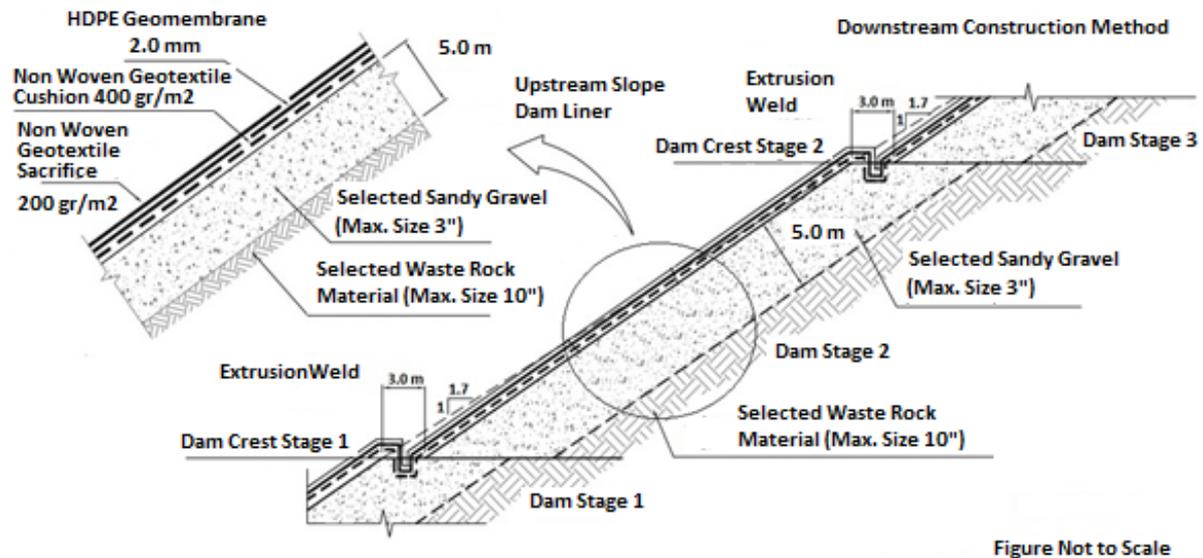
Mine waste rock (rockfill) dam upstream face waterproofing construction detail.
